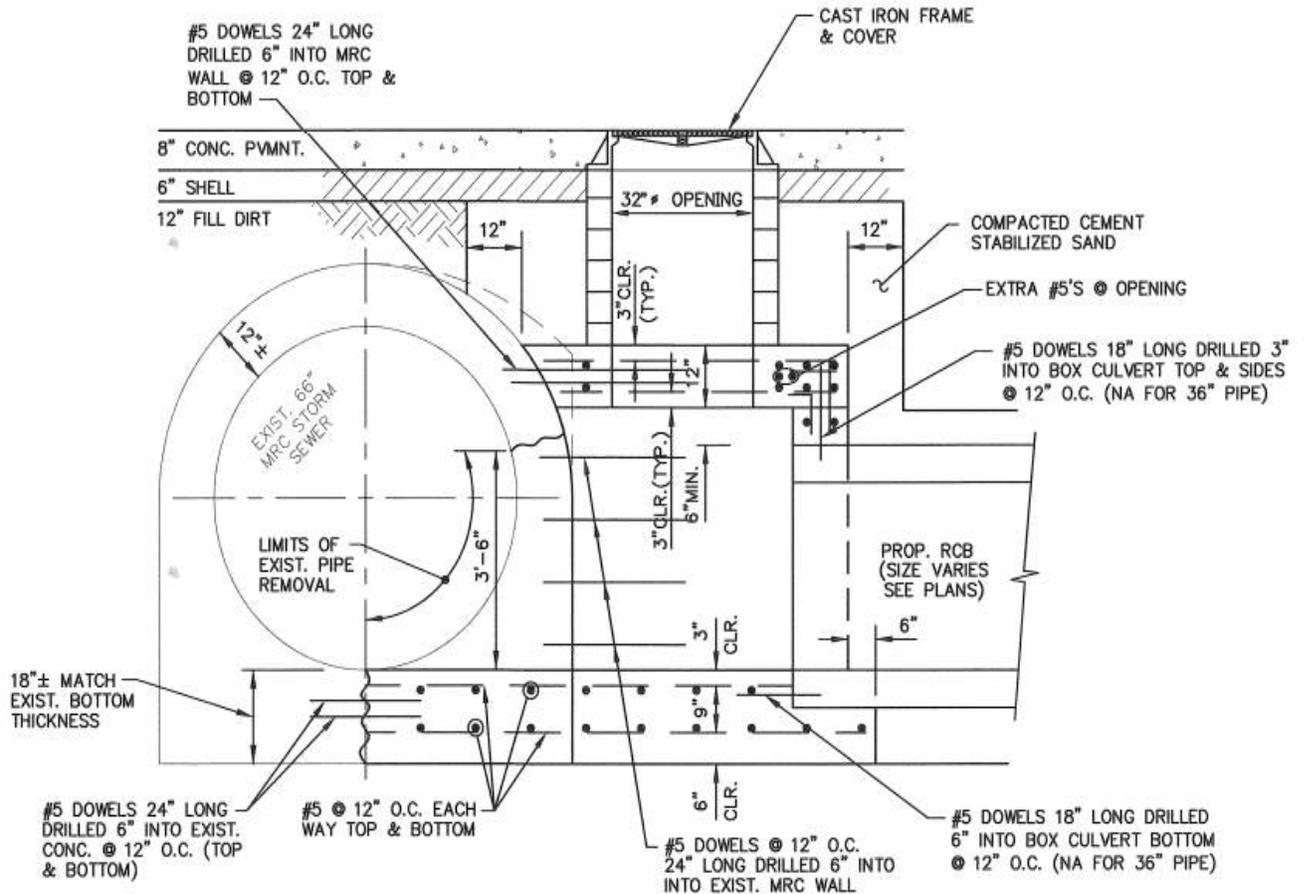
Detail for Connecting to Monolithic Concrete Storm Sewers
